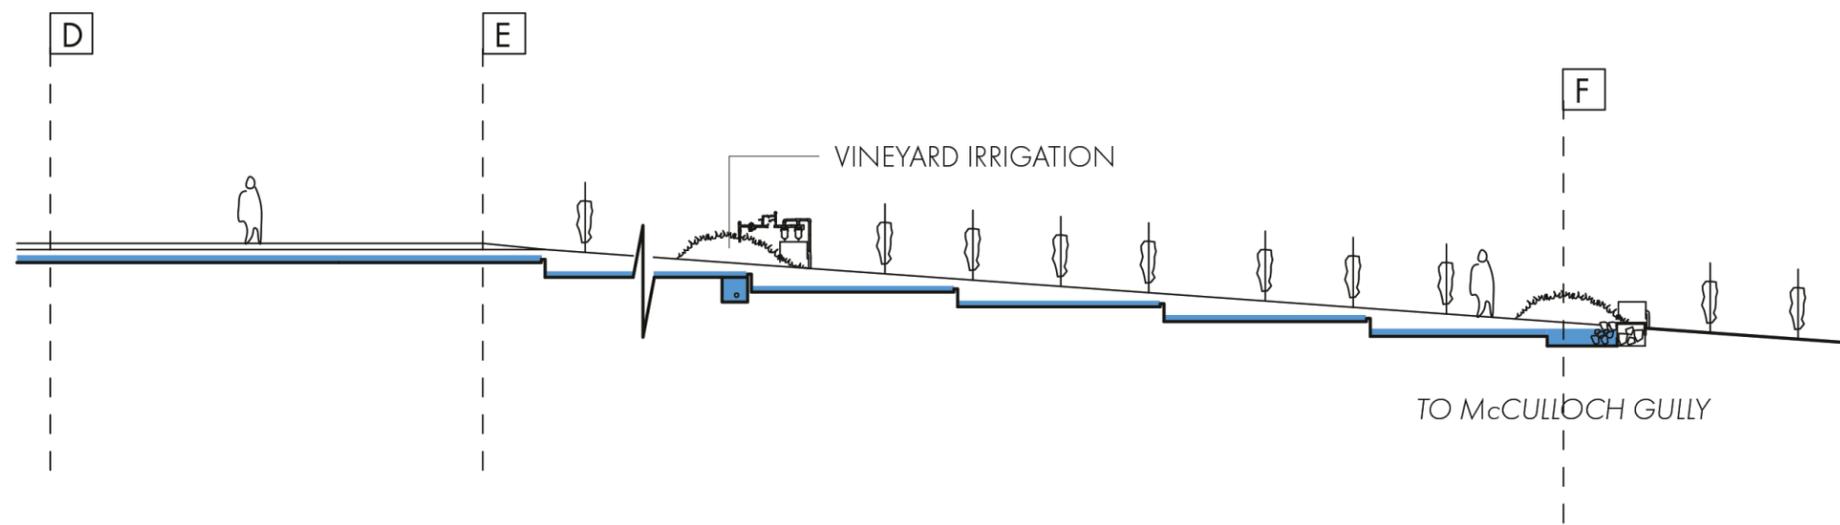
1:100 WATERCOURSE SECTION DETAIL 03
